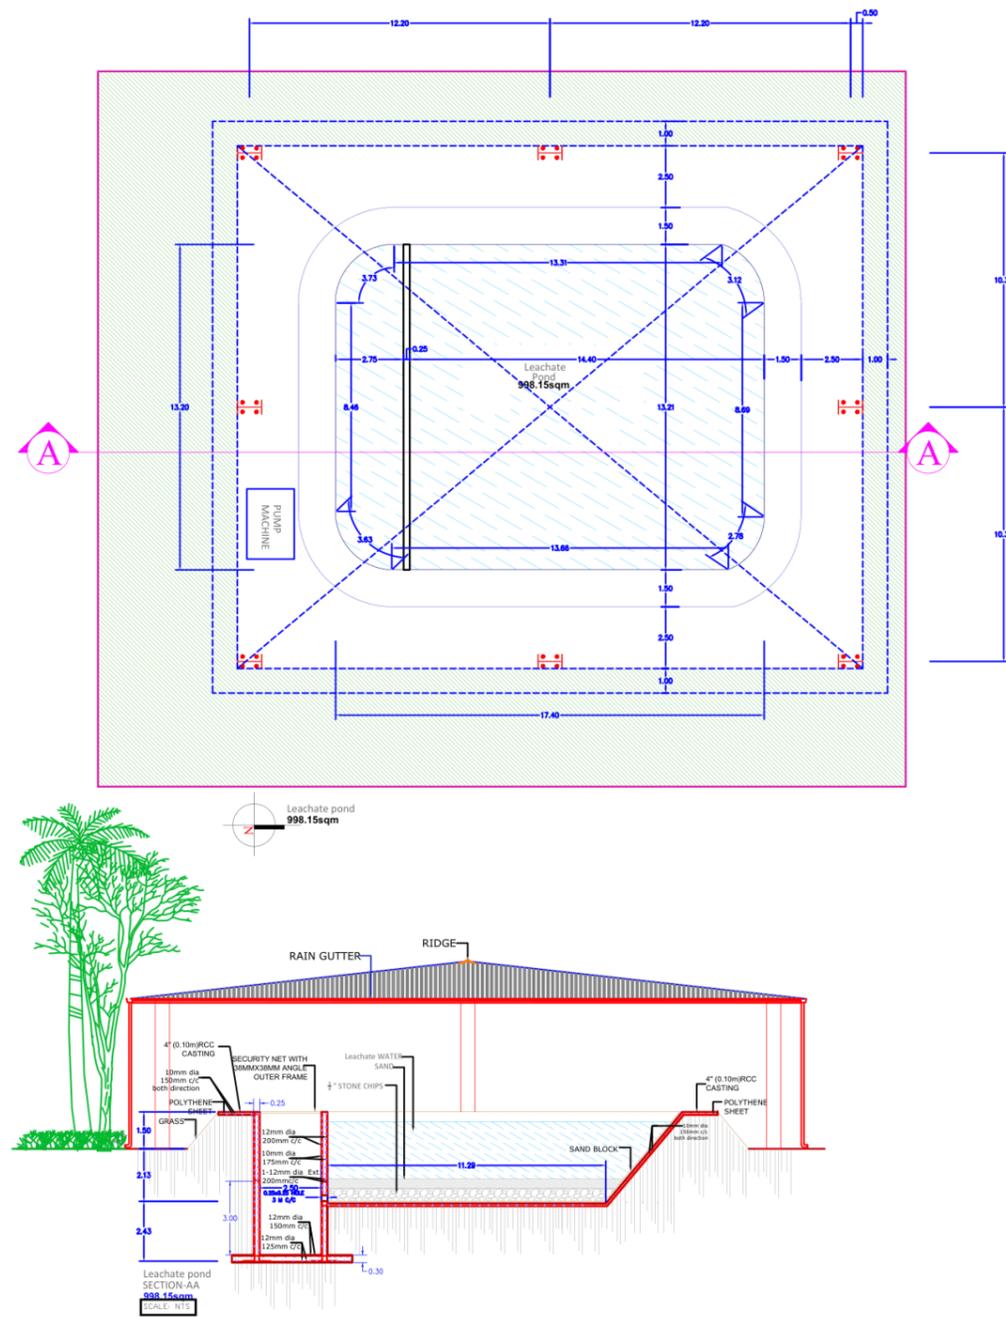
13: Detail drawing, design and section of Leachate Pond
